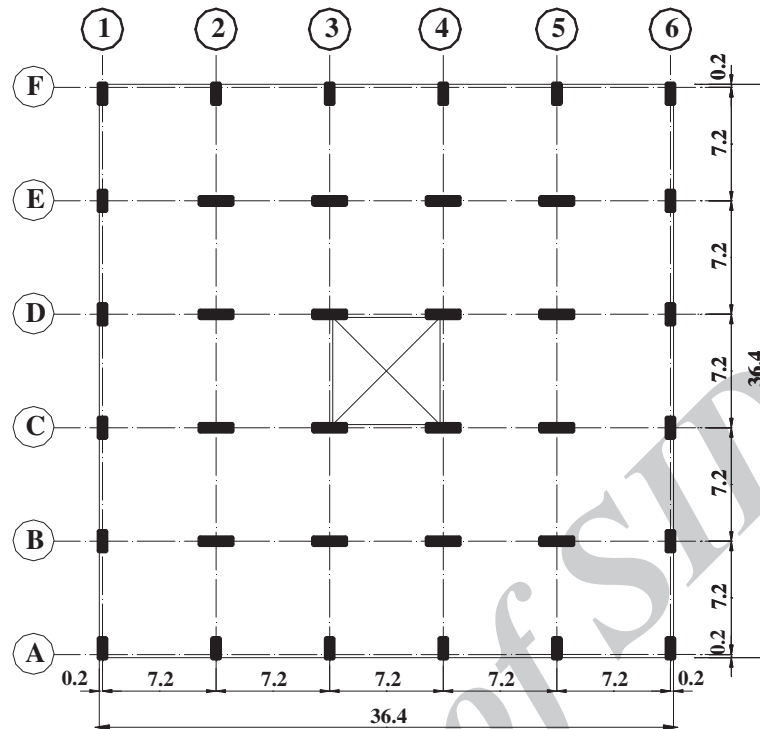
Plan of square cross-sectional flat-plate building (in meters).
